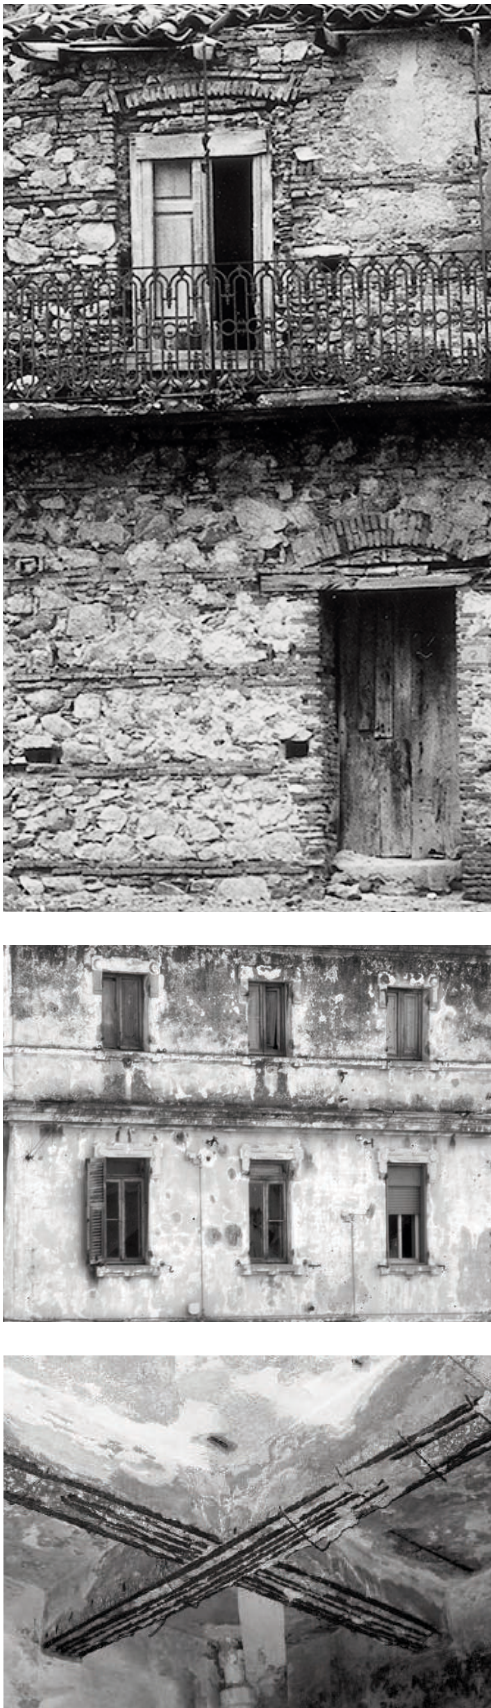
From the top: Residential Building in Badolato (CZ), IX century (by the author); Residential Building in Reggio Calabria, post-earthquake reconstruction (by the Author); Deteriorate reinforced concrete structure (credit: cfr. Nesi, 2008).
